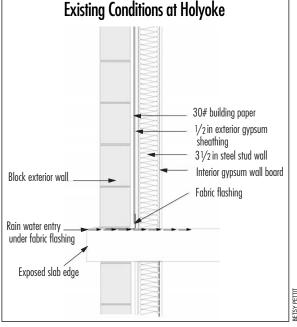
Rainwater entered the building, driven by wind, under the fabric flashing at the exterior balcony.
